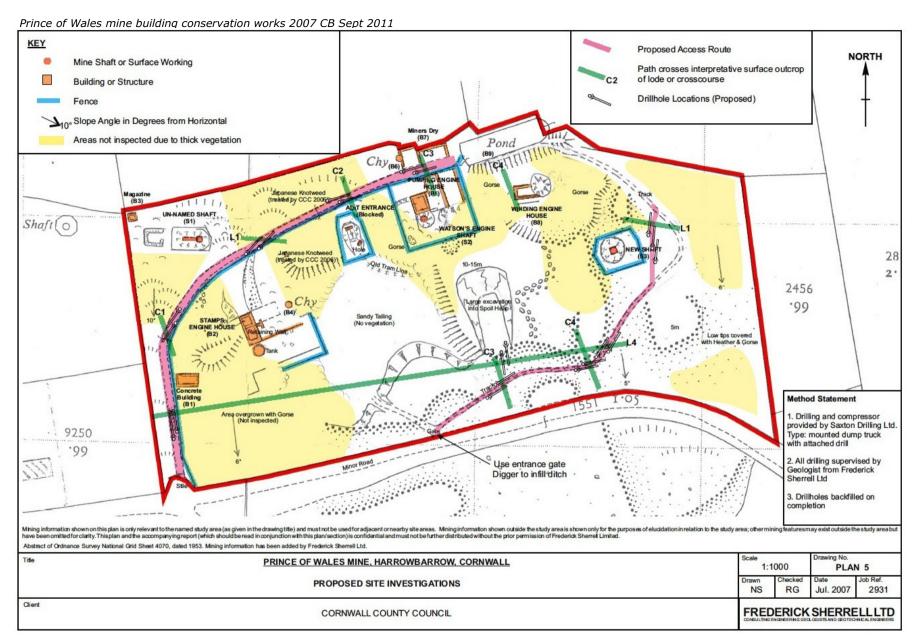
Geotechnical site plan of drilling site investigations (Sherrell 2007)
